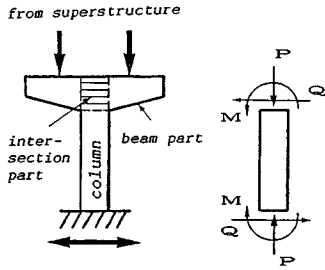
Modelling of T-shaped Steel Bridge Piers.
